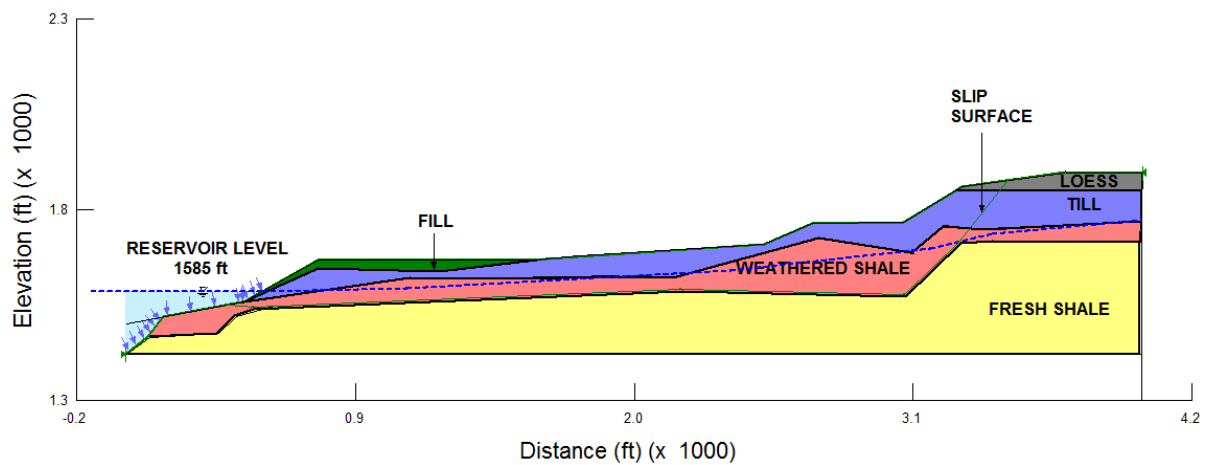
Slope/W representation of the slope at reservoir elevation of 1585 ft
